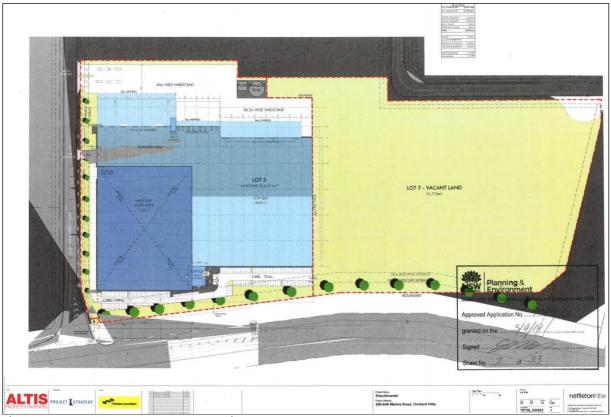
SSD-9429 Approved Site Plan (Source: NSW DPIE, 2019)
